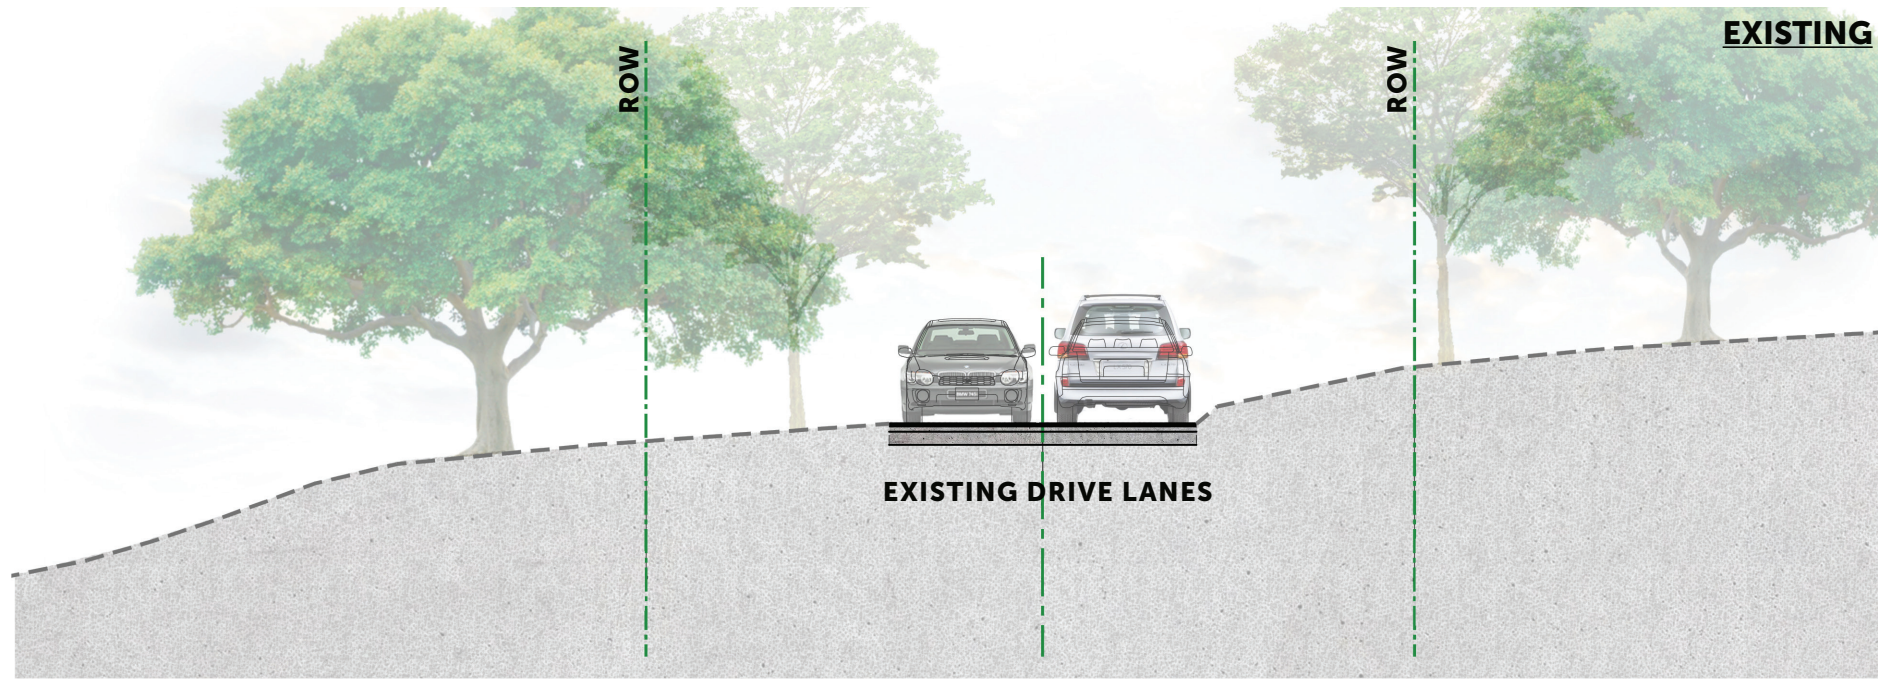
Bunker Hill Boulevard Existing Street Section
